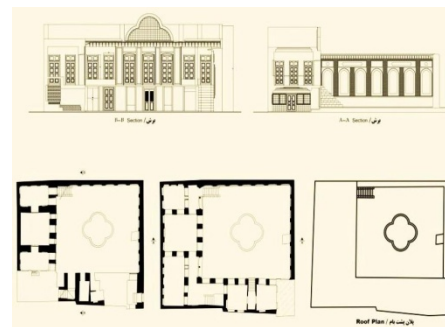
The plan of ground floor, first floor, roof side and section of Atroosh house
